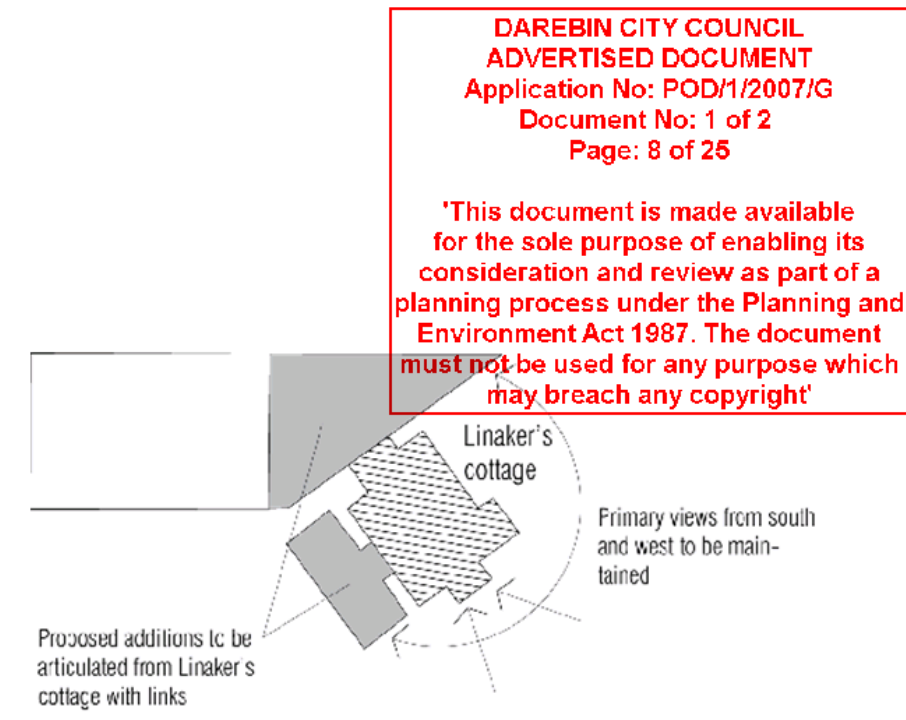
Indicative Future Additions to Linaker's Cottage (Source: HASSELL, 2008)
